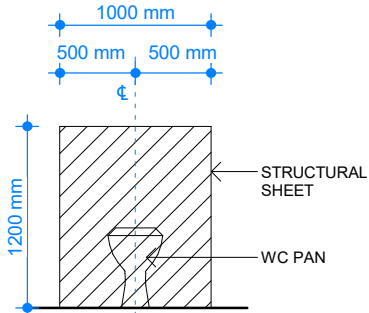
LOCATION OF SHEETING FOR A WALL BEHIND A TOILET PAN
